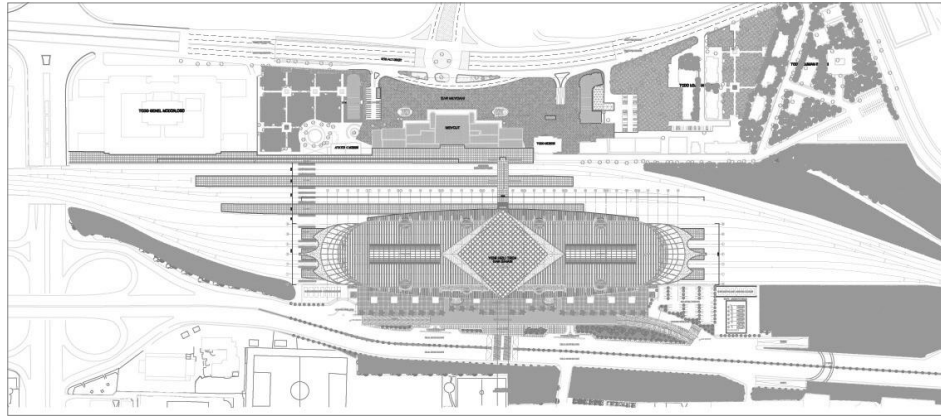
Site Plan of the Transformation project of Ankara Railway Area. (TCDD)
